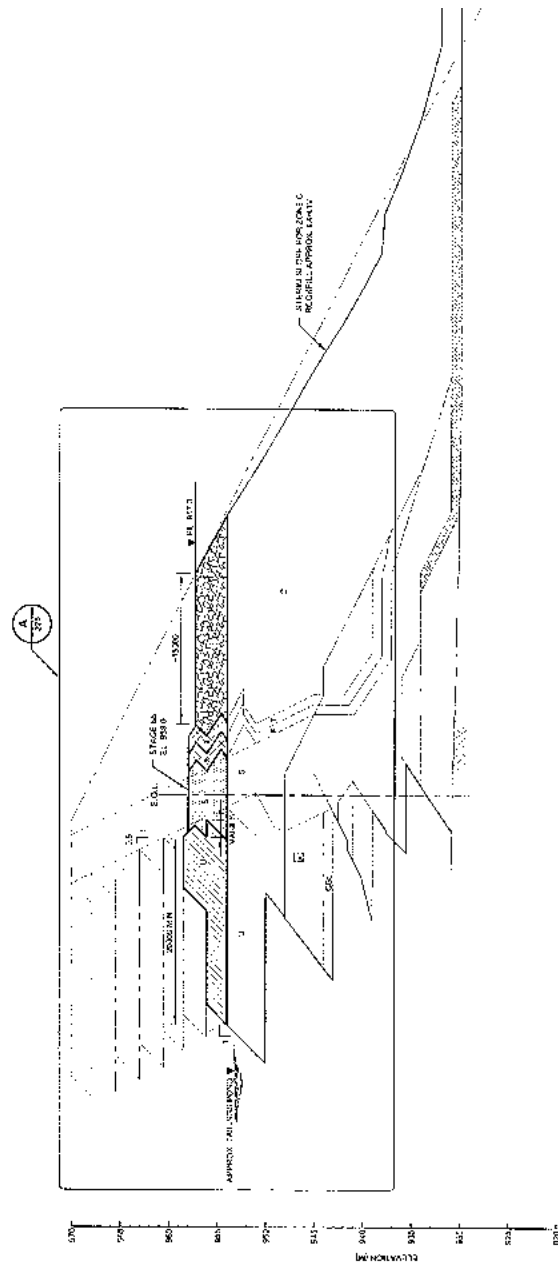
Stage 6b PE Section, As-Built, Reflecting an Interim Slope of 1.4H:1V
